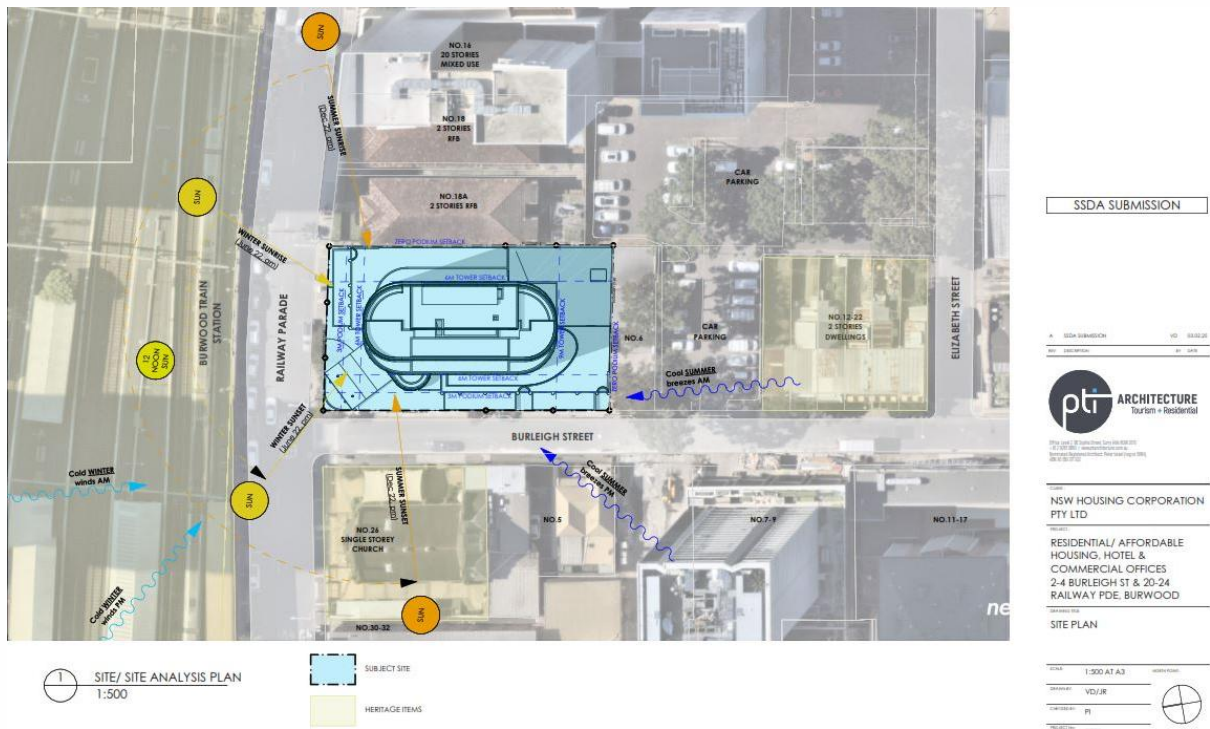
Overlay of the proposed development footprint showing extent of basement levels within the Project Area from Railway Parade to the boundary with 6 Burleigh Street. Source: PTI Architecture, 3/02/25)
